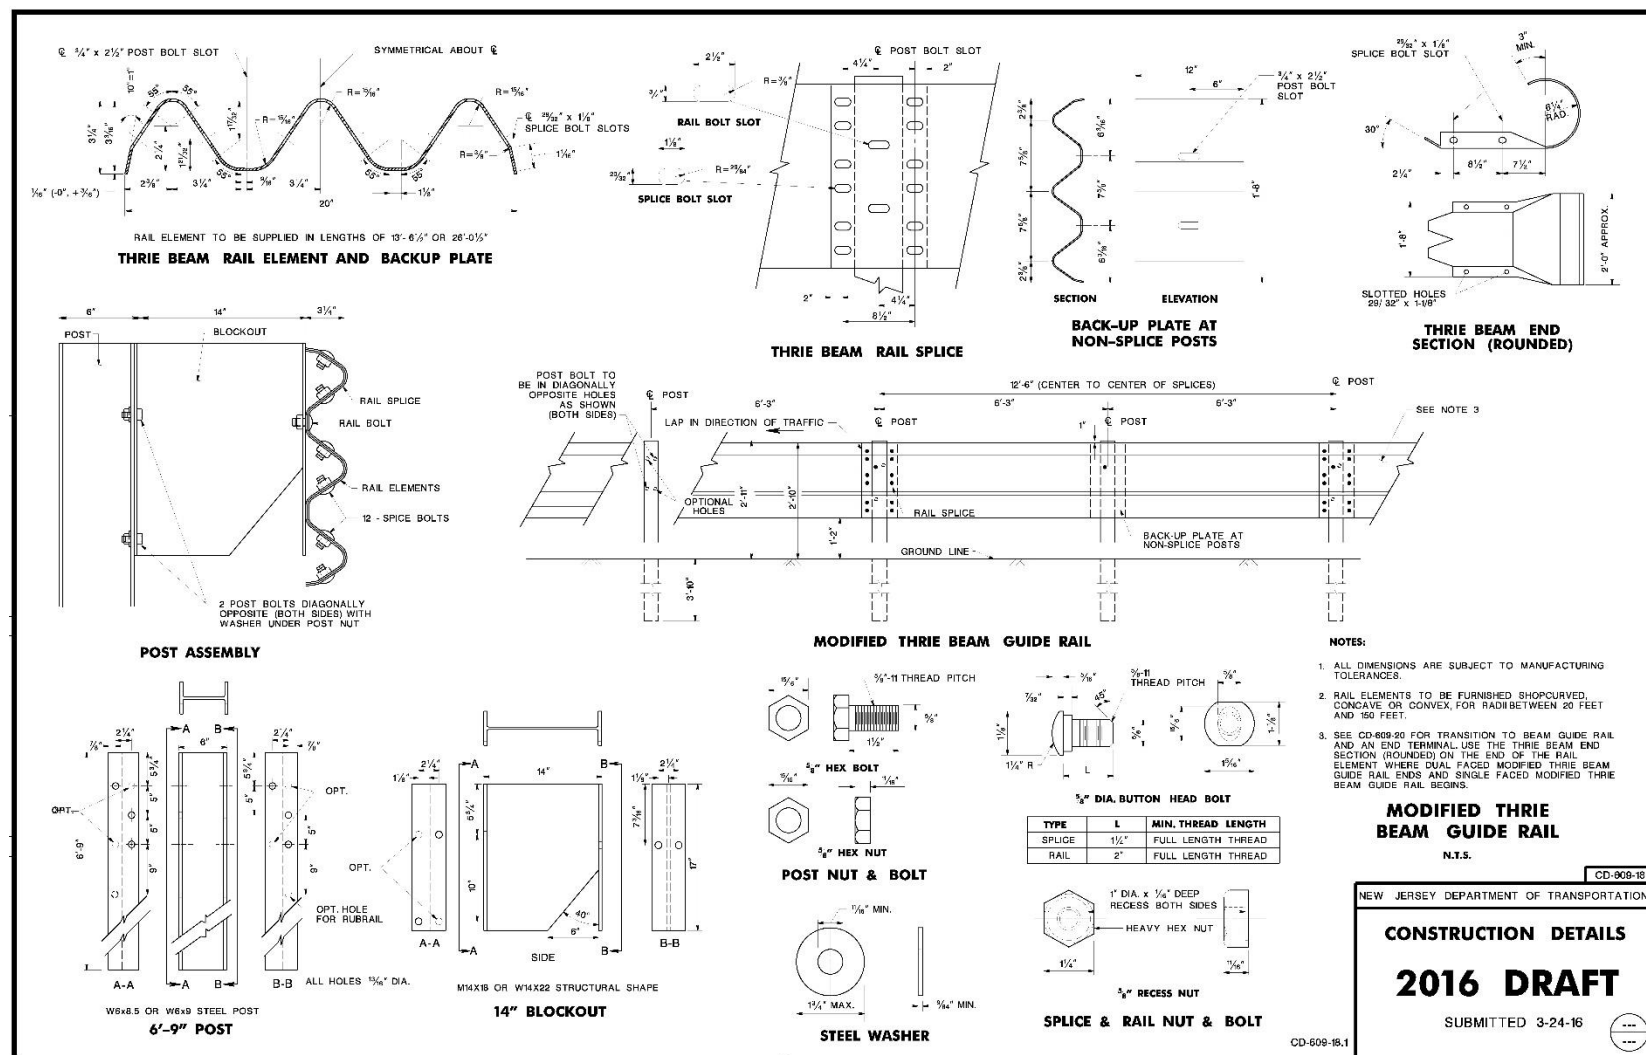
NJDOT Modified Thrie Beam Details, Test No. MTB-1
